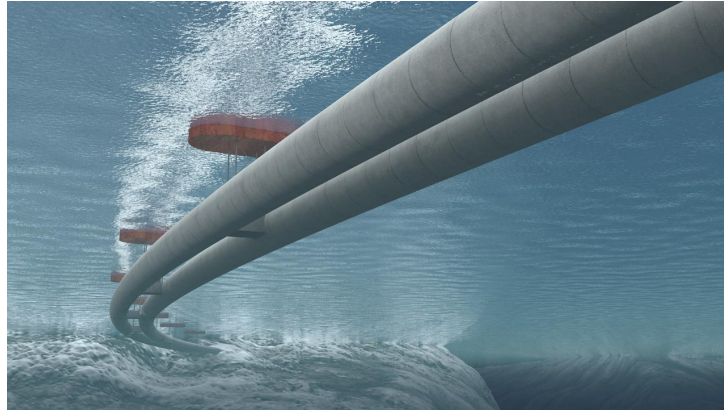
Submerged floating tunnel with pontoon support.(Illustration: NPRA)
